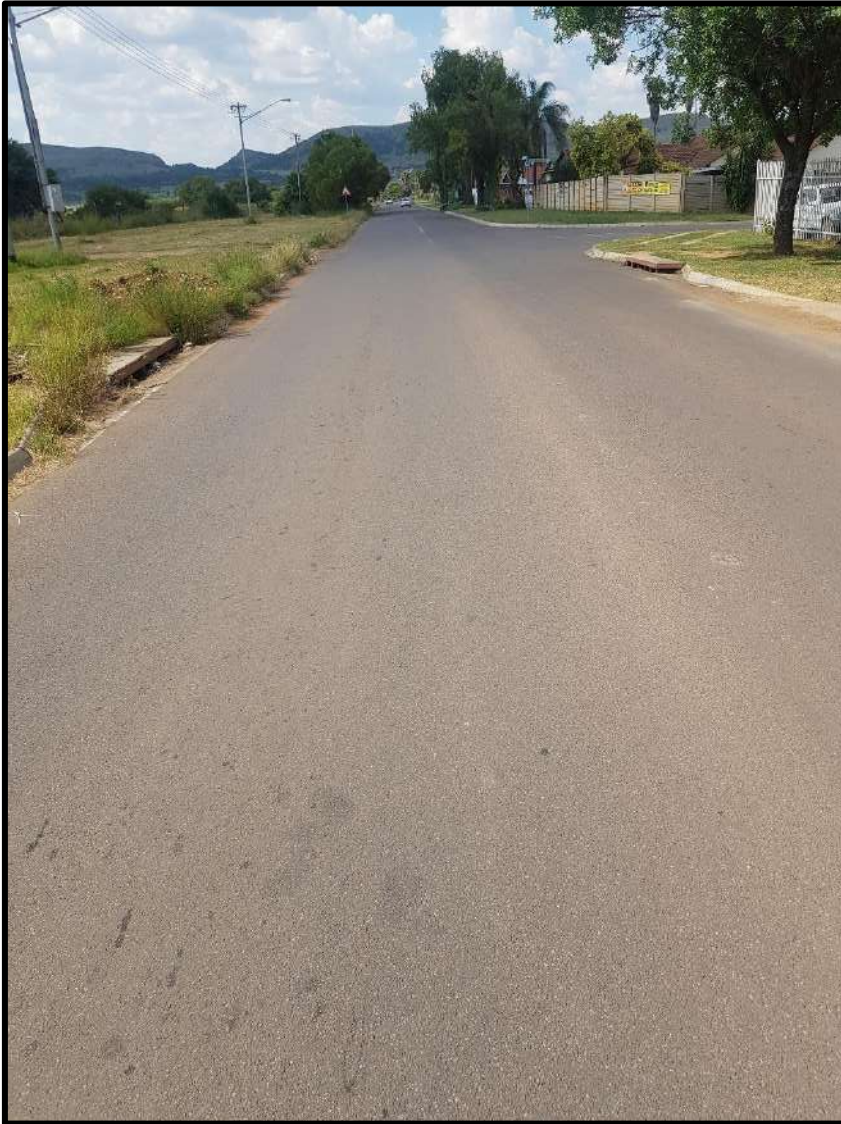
Mulder Street and Boekenhoutkloof Street Intersection.
